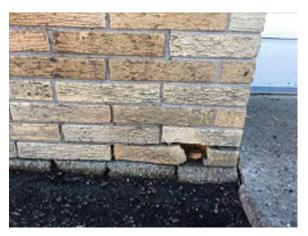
Brick throughout the 1954 exterior shows mortar cracking. Tuckpoint exterior. Patch in brick as needed. (Priority 0)
